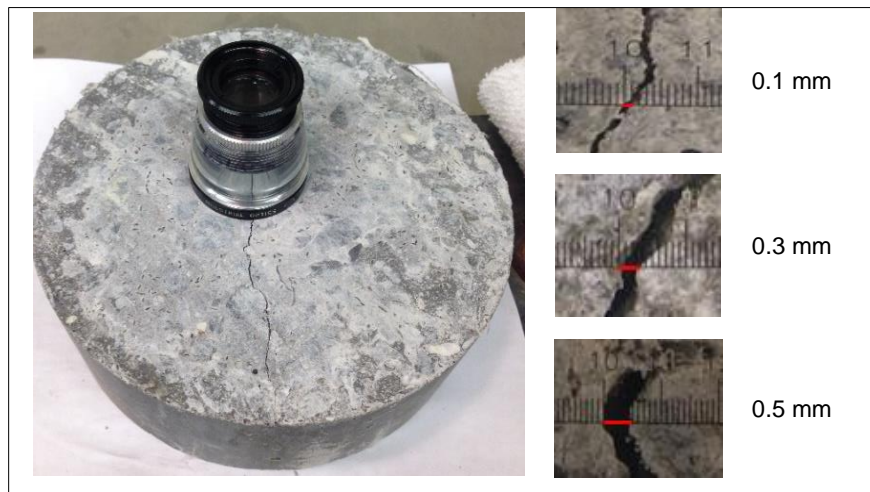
Example Specimens: Formed Crack and Unloaded Crack Widths
